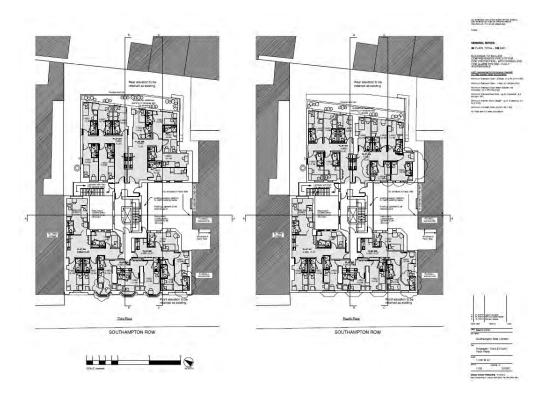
Proposed Development-Typical floor plans-Residential units. (Casson Conder Partnership 2012)
